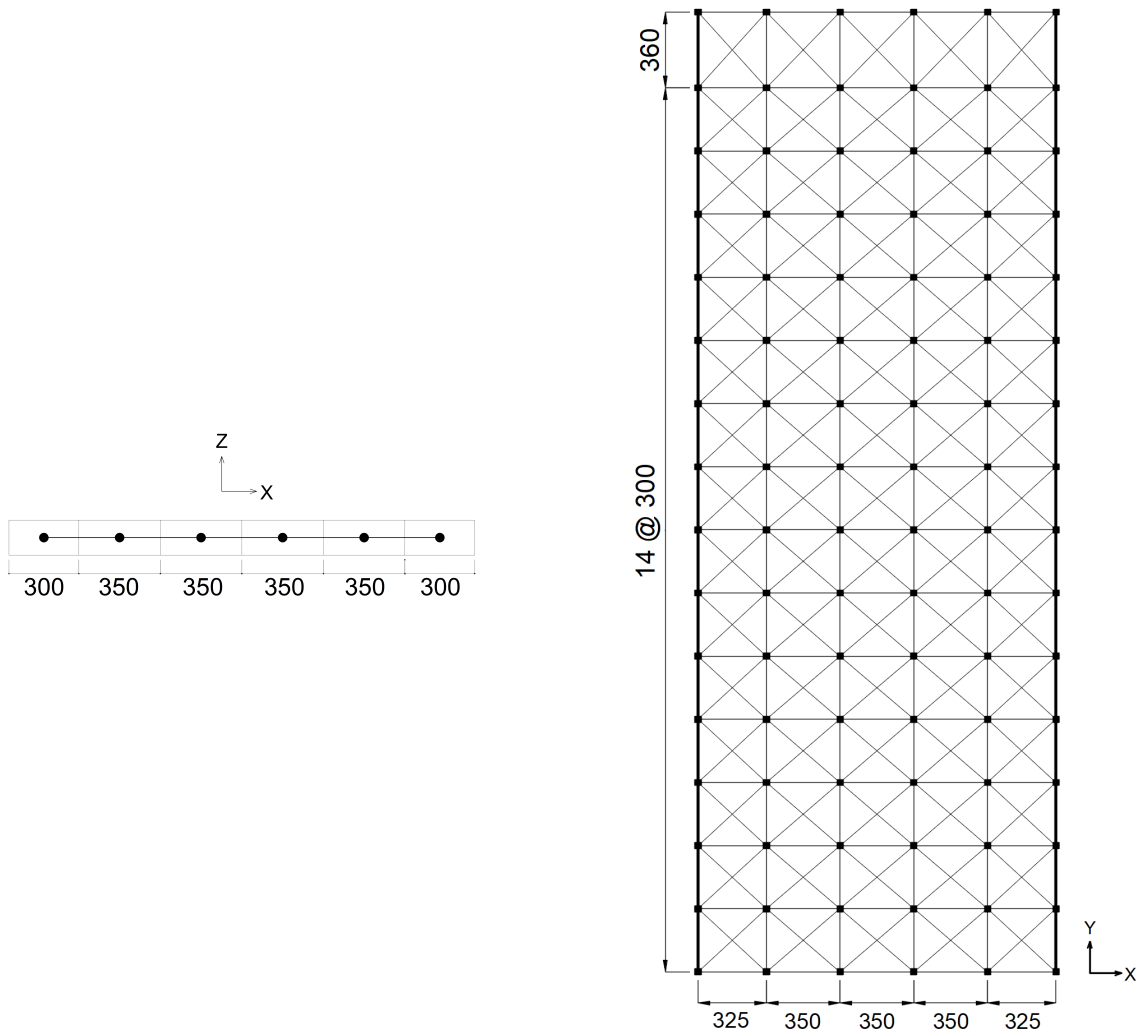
Plan and elevation views of the beam-truss model for WSH4 [Unit: mm].
